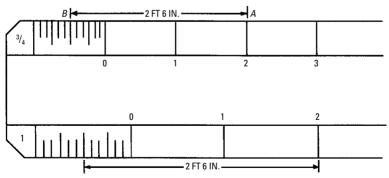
A typical architect's scale with detail showing $\frac{3}{4}$ and I inch to the foot.
